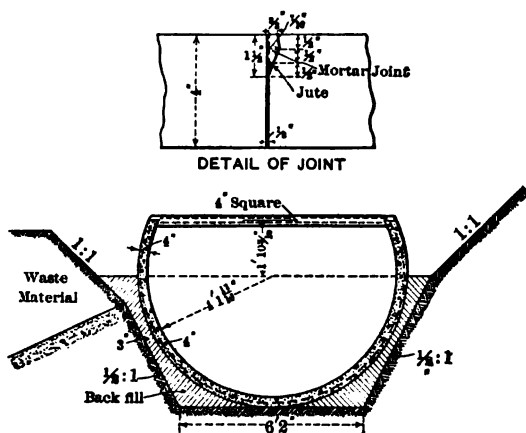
Reinforced Concrete Canal Lining. Tieton Canal, Wash.
